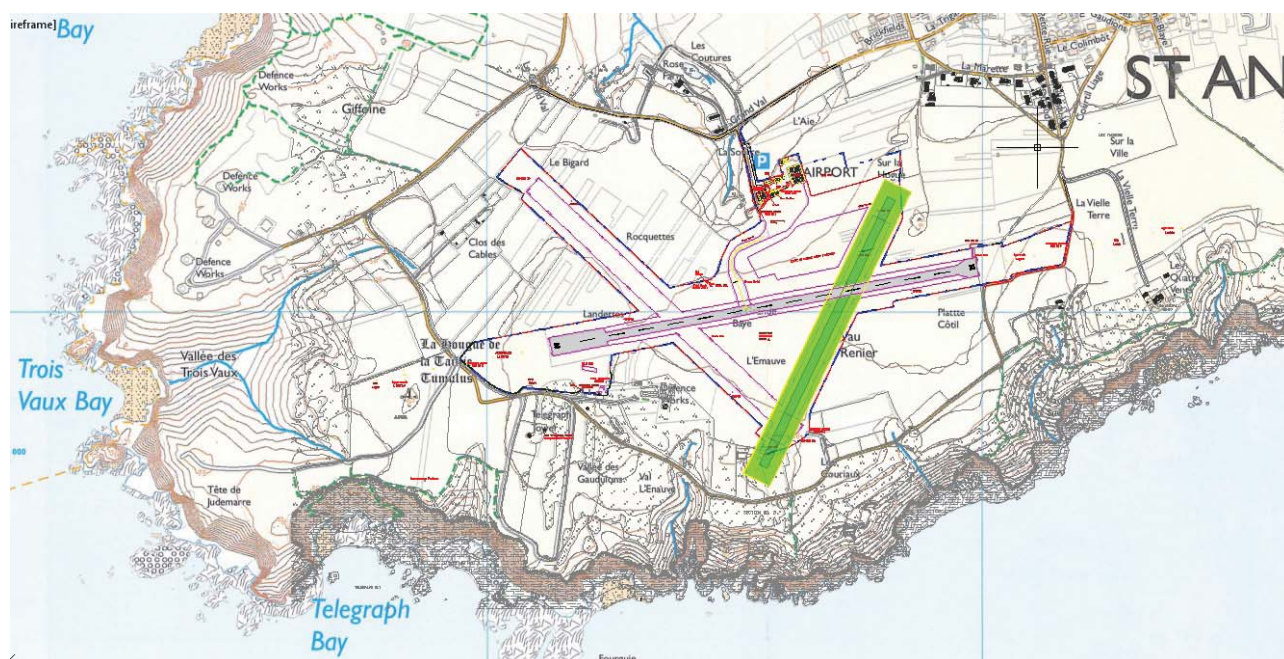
Discussion option – Runway 03/21 600m long on existing alignment
